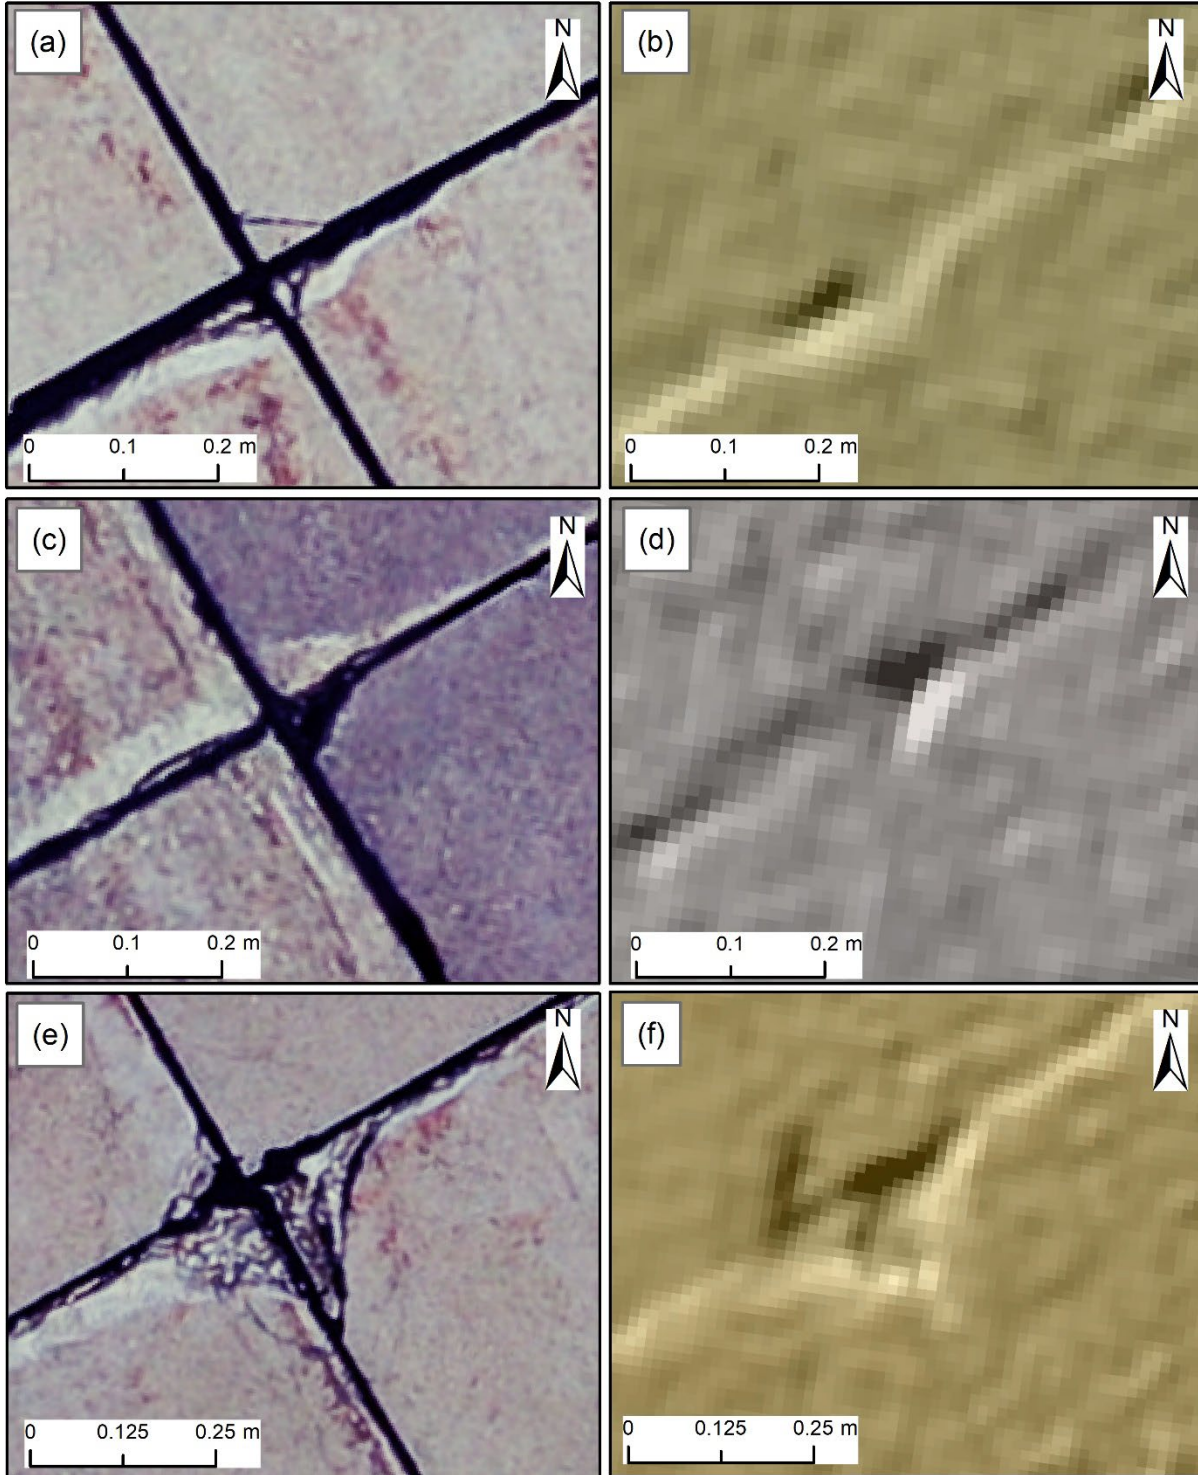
Corner Spalling (L) on Top and ASR (L) on Bottom-left and Bottom-right of Joint Intersection in (a) 3.2-mm/pix Orthophoto and (b) 12.9-mm/pix DEM; Corner Spalling (M) on Left in (c) 3.2-mm/pix Orthophoto and (d) 12.9-mm/pix DEM; and ASR (H) in (e) 3.2-mm/pix Orthophoto and (f) 12.9-mm/pix DEM
